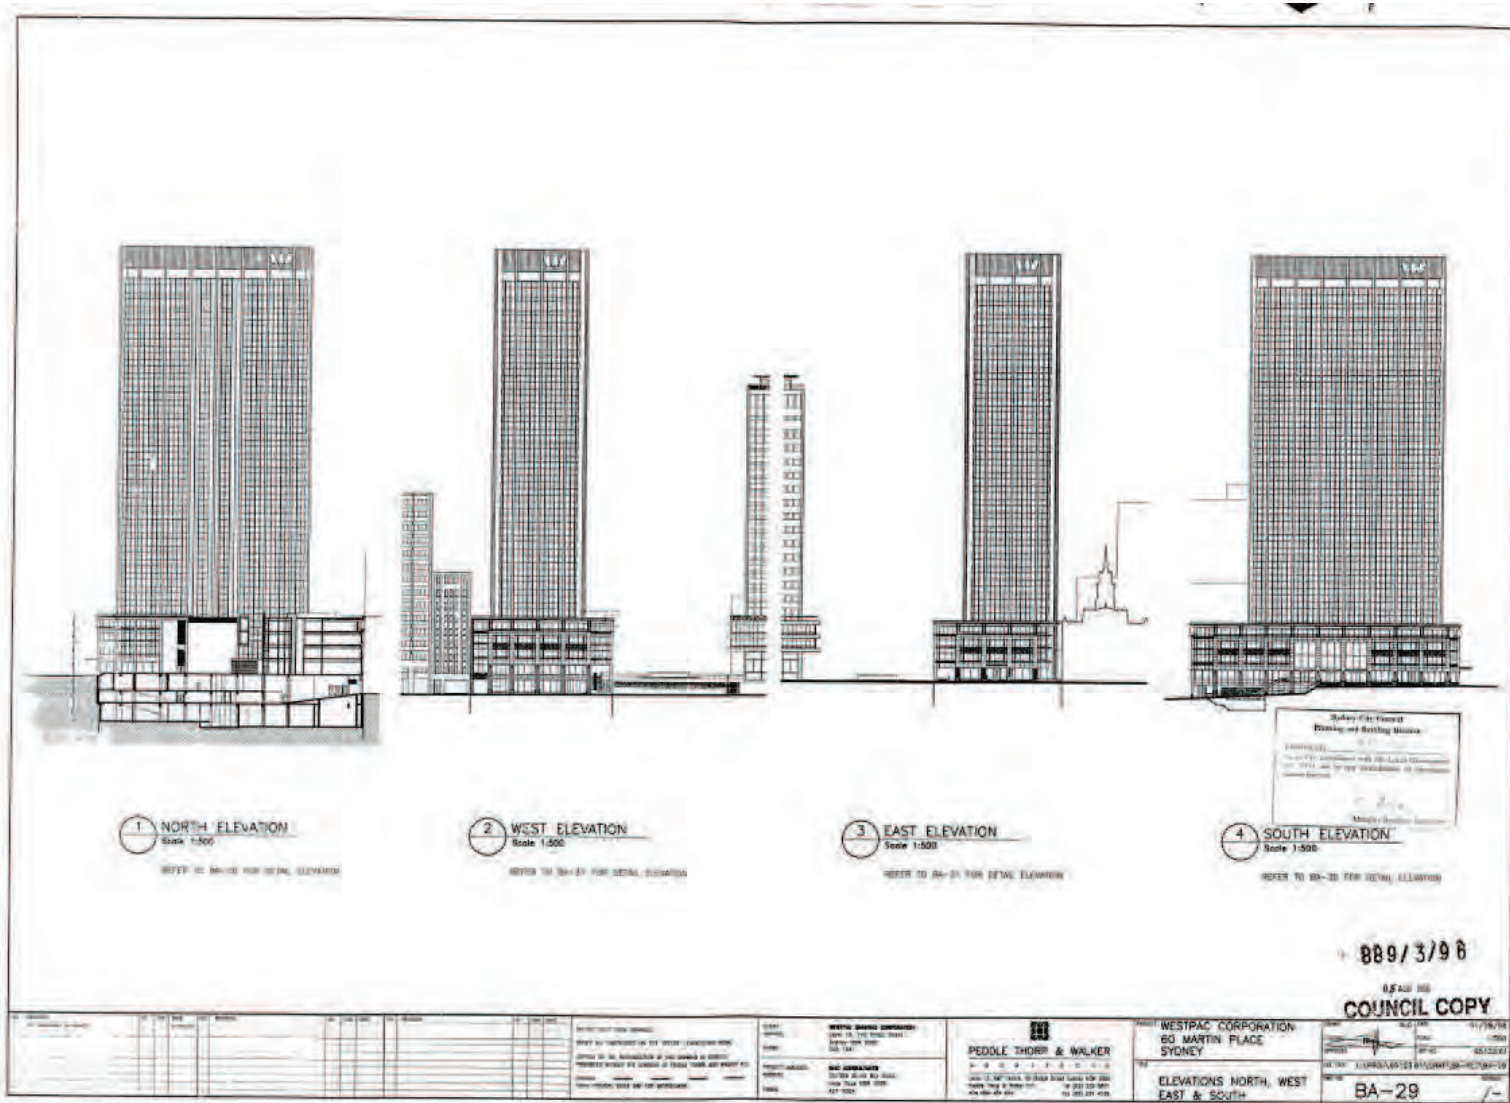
Elevations of the podium additions at 60 Martin Place, Sydney. The eastern elevation illustrates the podium's relationship with the parapet and tower of the adjoining St Stephen's Uniting Church.
